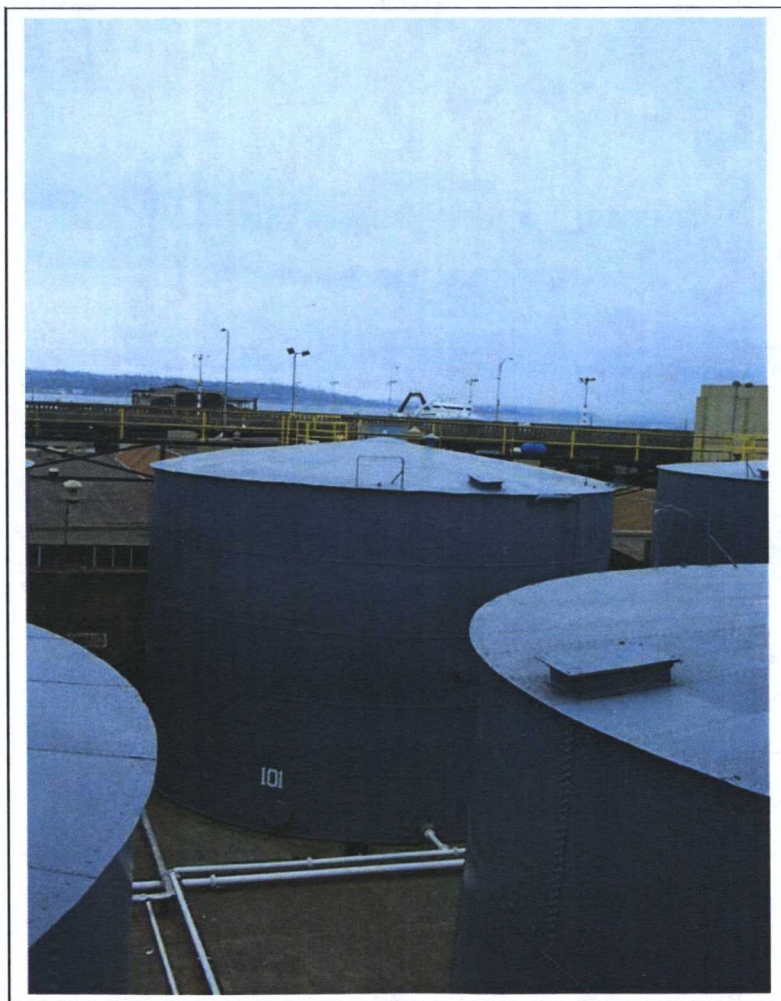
View looking south to southwest at the Black Oil Yard, W. Garfield Street Viaduct, and Elliott Bay beyond.
